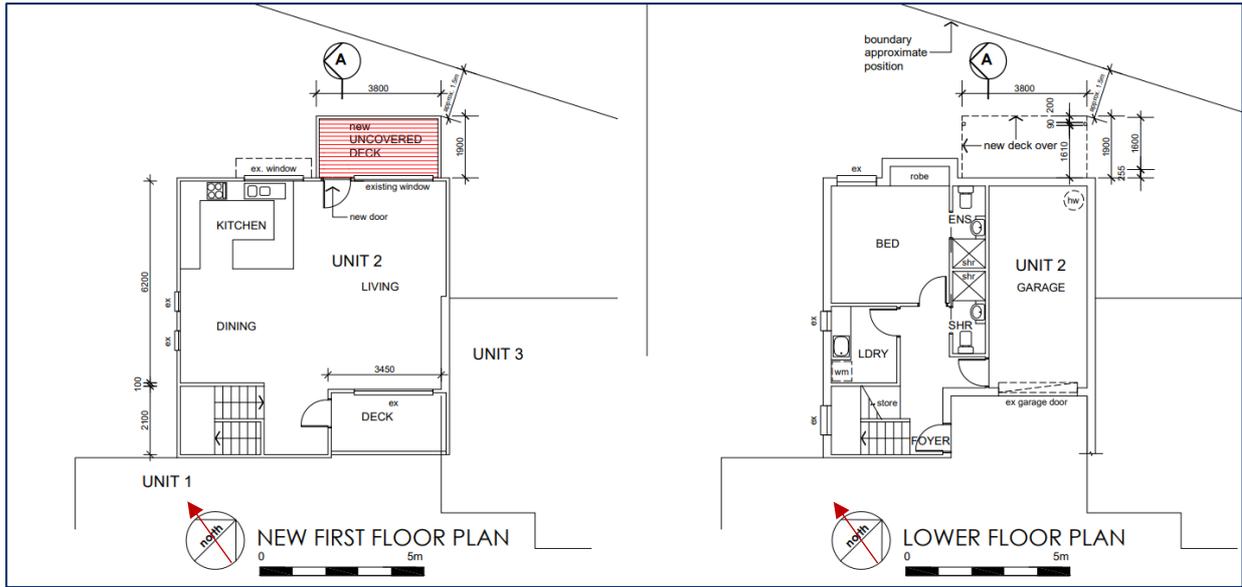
| Aspen Creek 2 Floor Plan (Source: Applicant's documentation, with red arrow annotation to correct north point)
